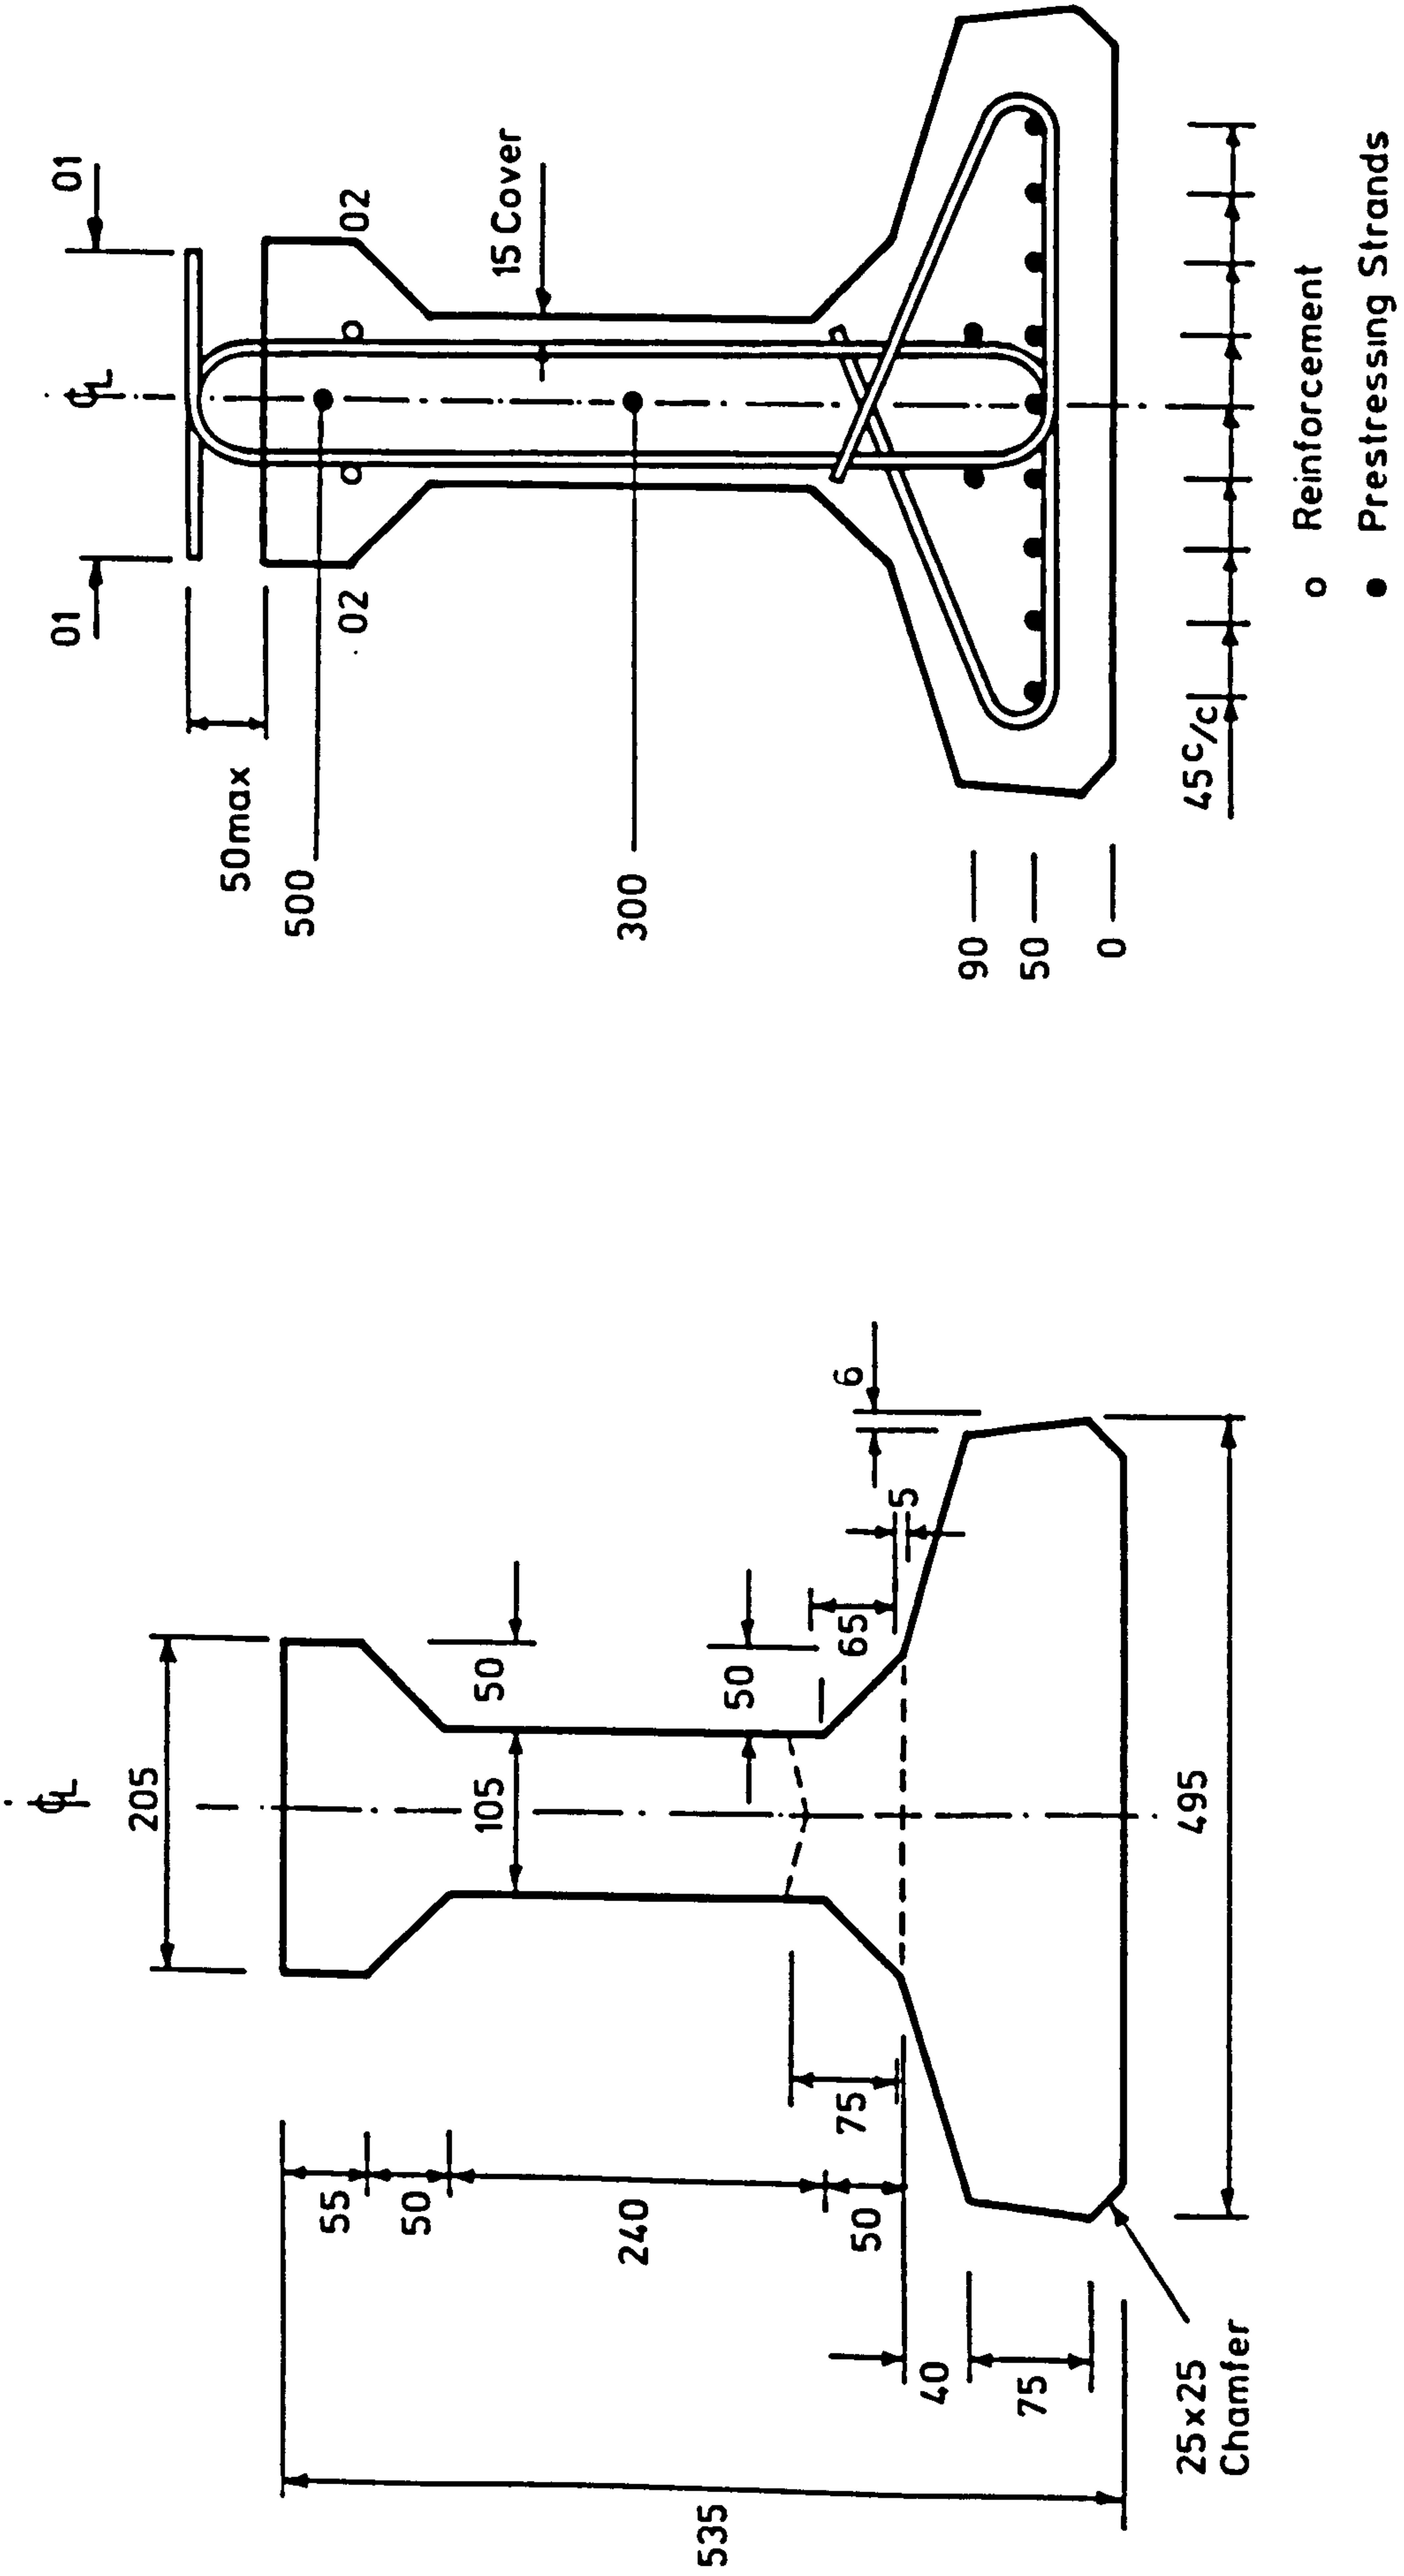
DETAILS OF FULL SIZE PROFILE AND PRESTRESSING LAYOUT
